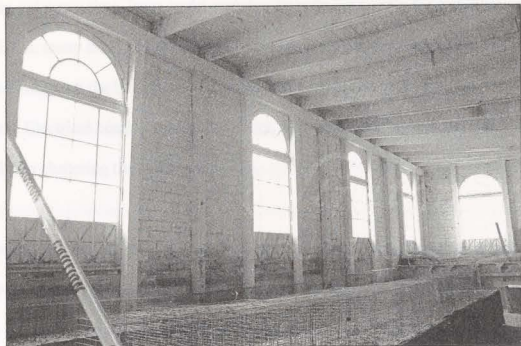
Interior of poultry building showing terracotta tile block walls, concrete stem walls and wood post and beam system supporting flat roof. Photograph by author, 2008.
